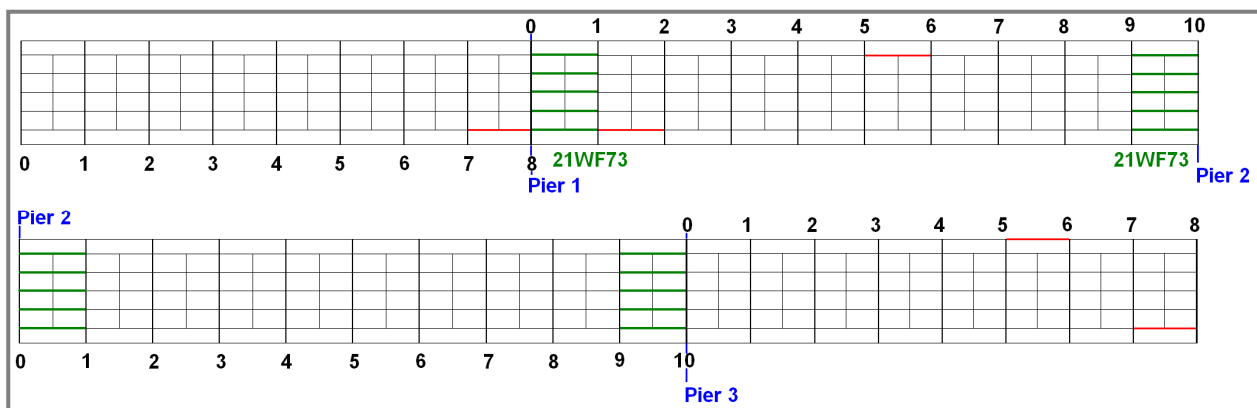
Framing plan with strengthened stringers in red, 21WF73 stringers are highlighted green, and remaining black stringers are 21WF62 (Spans 1 and 2 above Spans 3 and 4)
